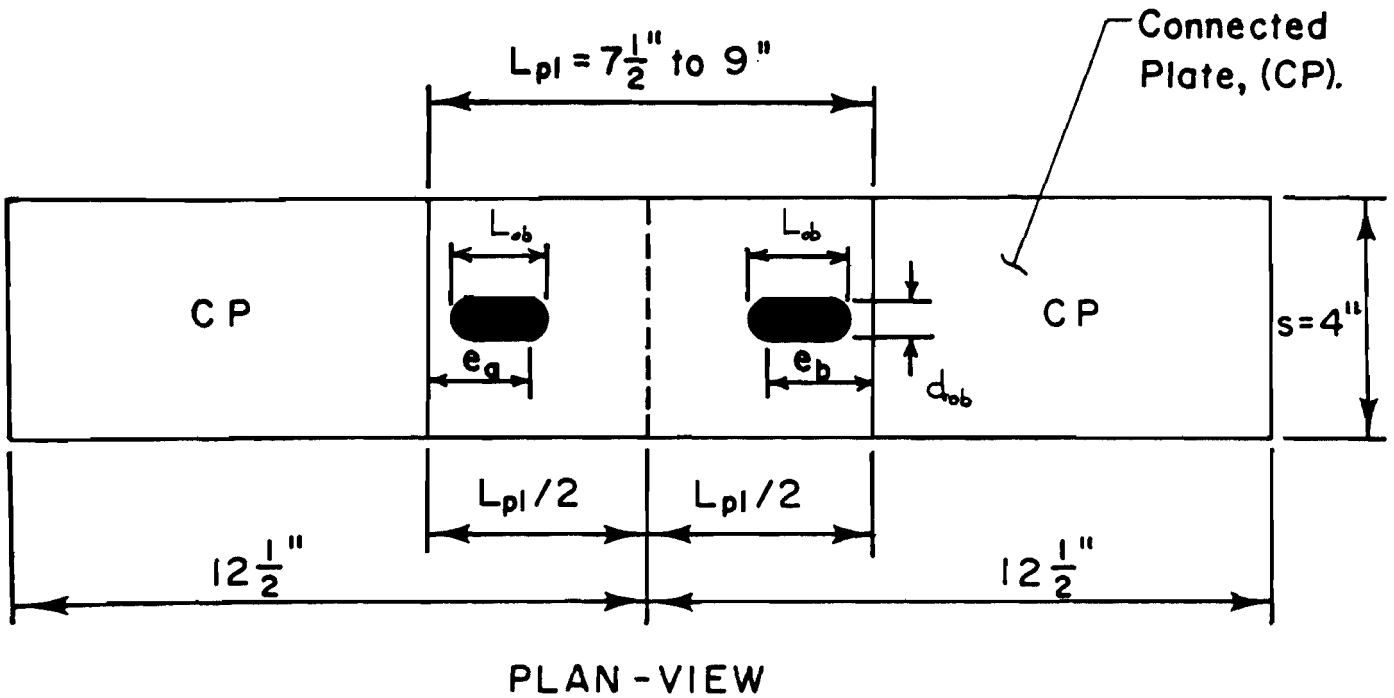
Single-Sheet Oblong Puddle Weld Connection
